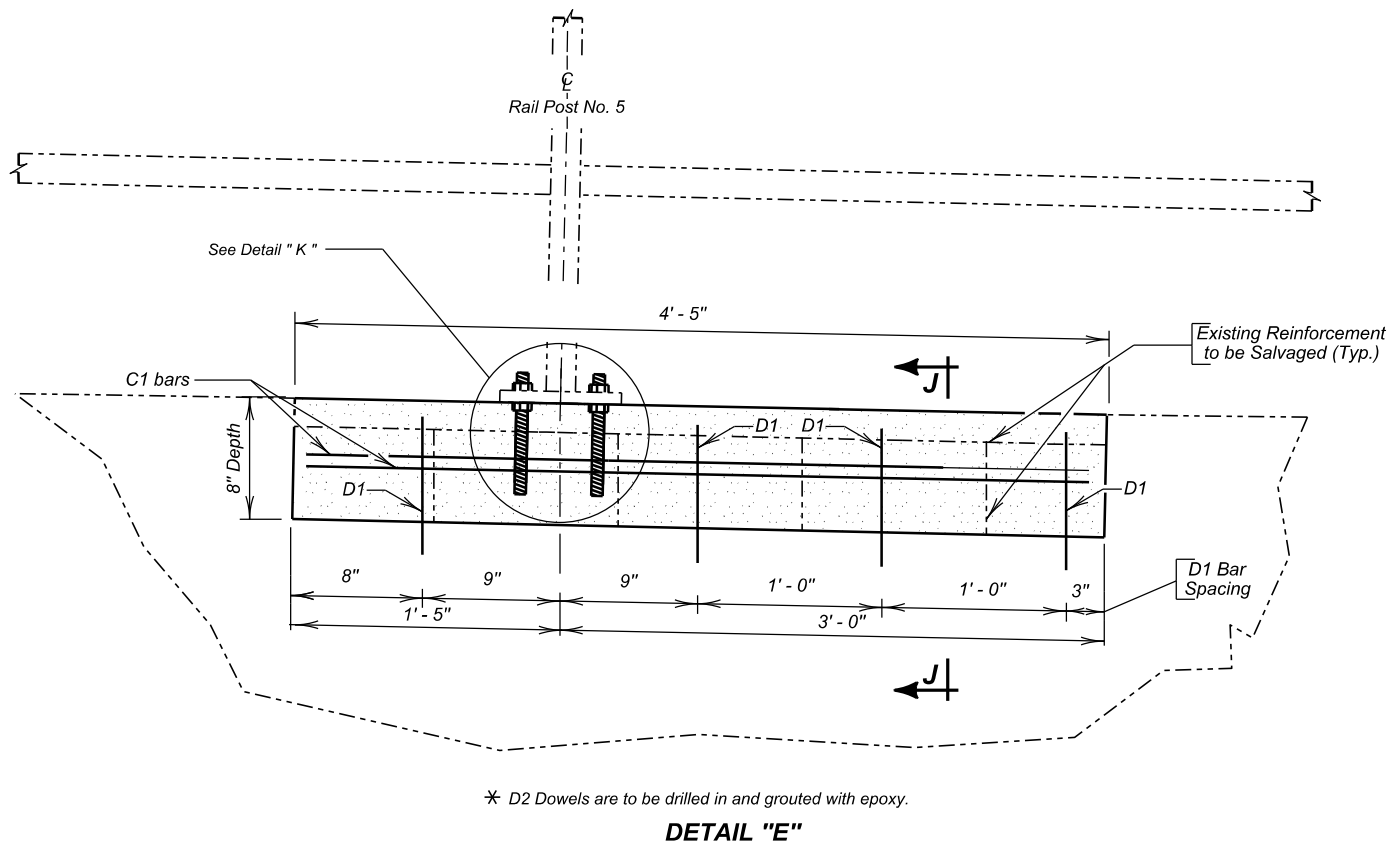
DETAILS ON REPAIR SECTIONS (CONTINUED)
